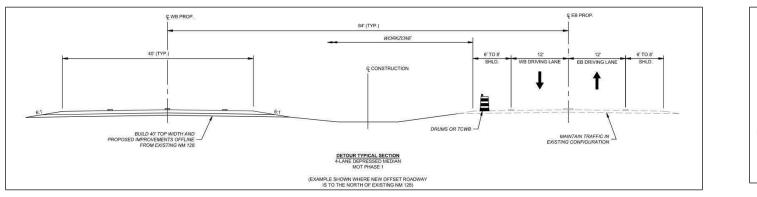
D. NM 128 MOT Typical Section – Four Lane Construction
